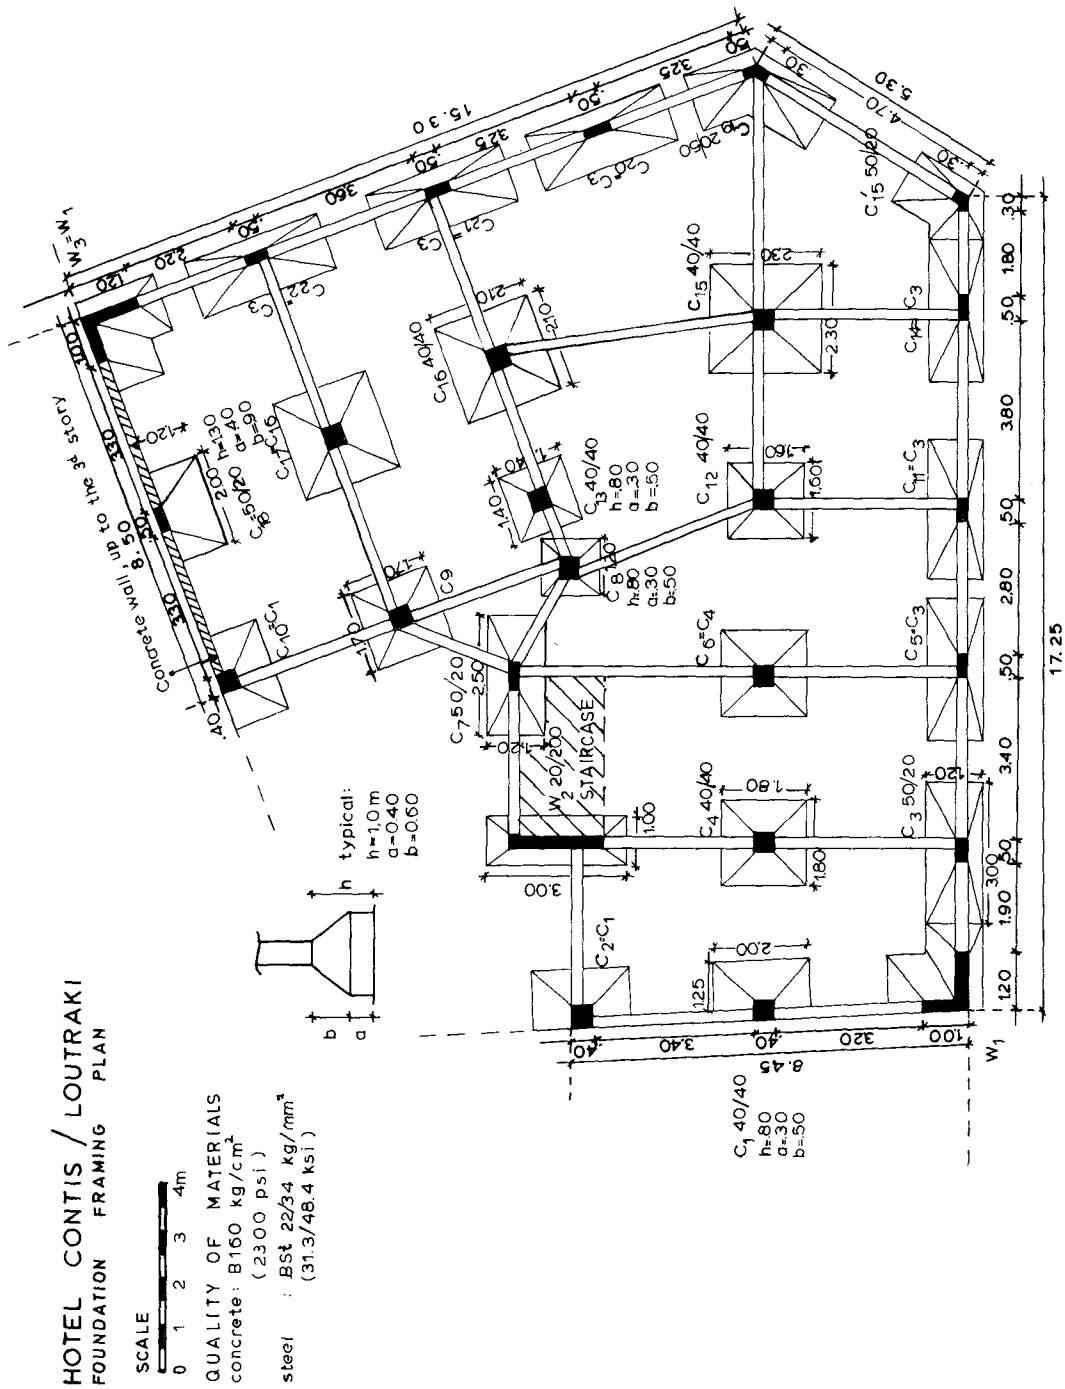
Contis Hotel in Loutraki. Foundation framing plan.
